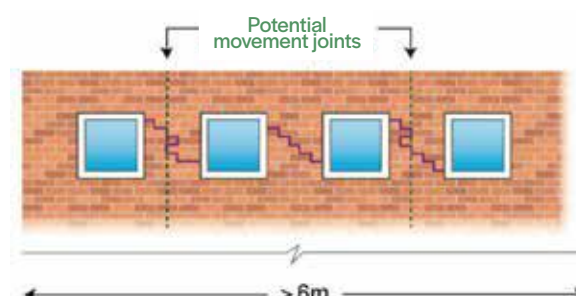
Long runs of uninterrupted brickwork, especially when vertical loading is low, can lead to diagonal cracking of narrow brickwork panels between window openings.
